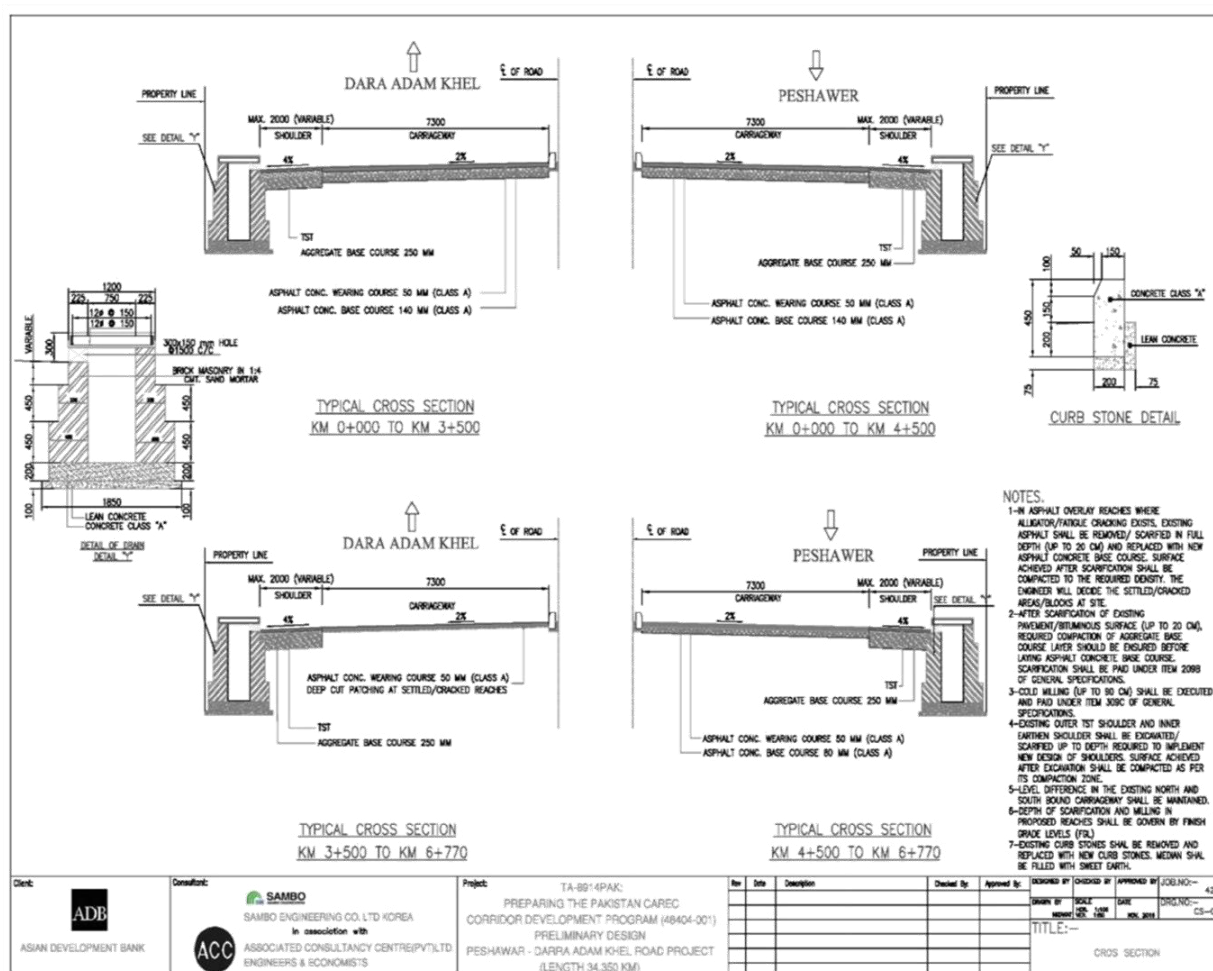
Typical cross section of the road between km 0+000 to 4+500, and km 4+500 to 6+770
